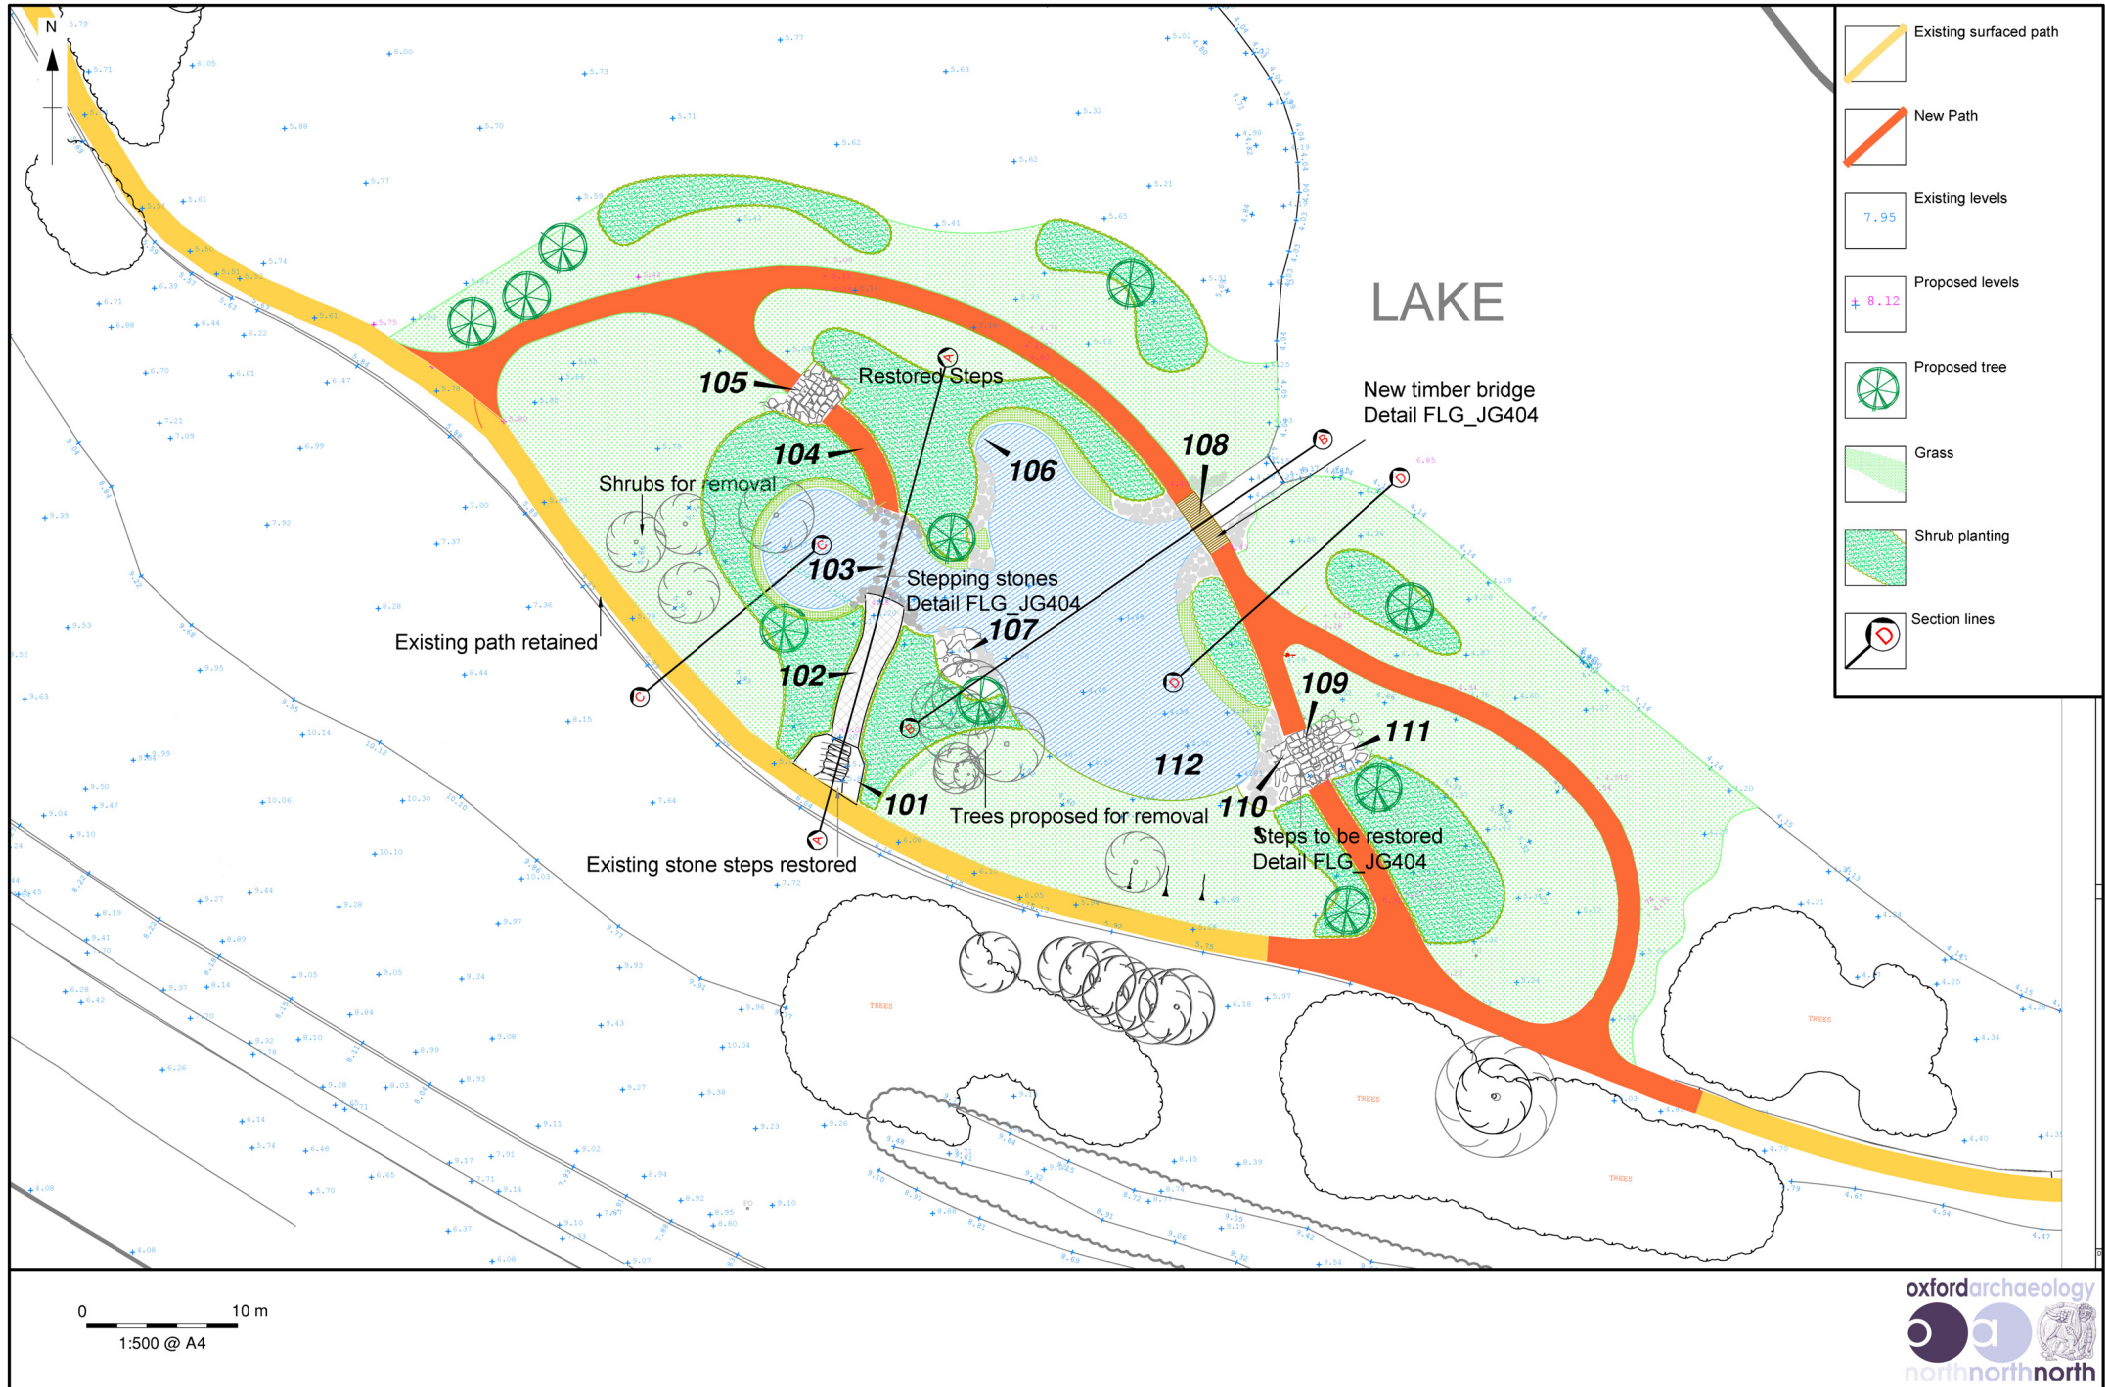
Japanese Garden restoration plan, showing layout and main features of interest
